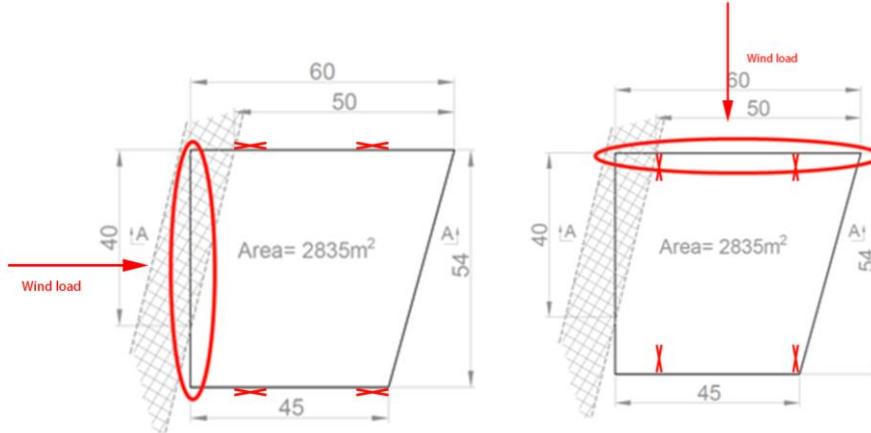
Plan view showing projected area of the four north-south (left) and east-west (right) bracings
